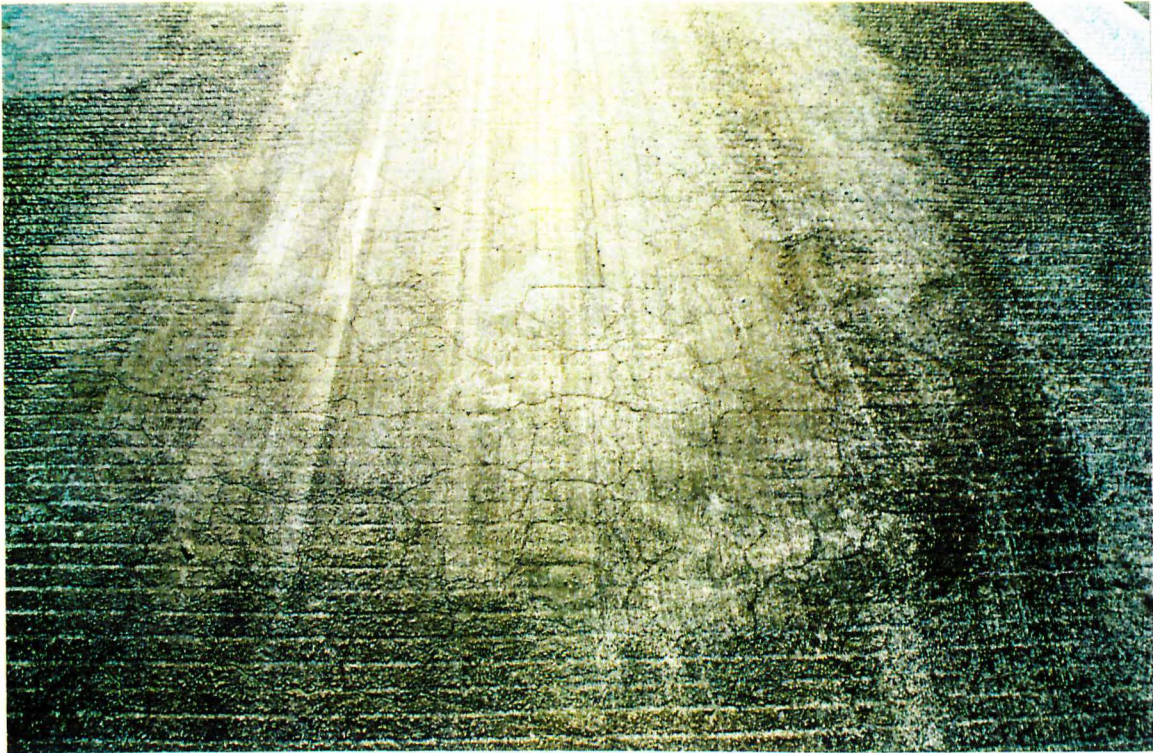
Medium severity alligator cracking with liquid asphalt seal on runway
